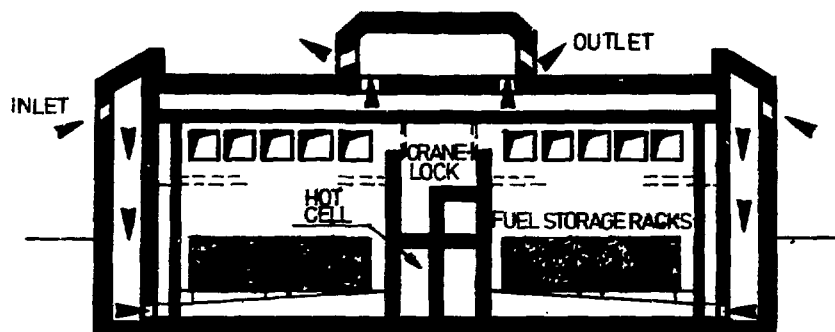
GENERAL ARRANGEMENT OF A DRY STORAGE FACILITY
